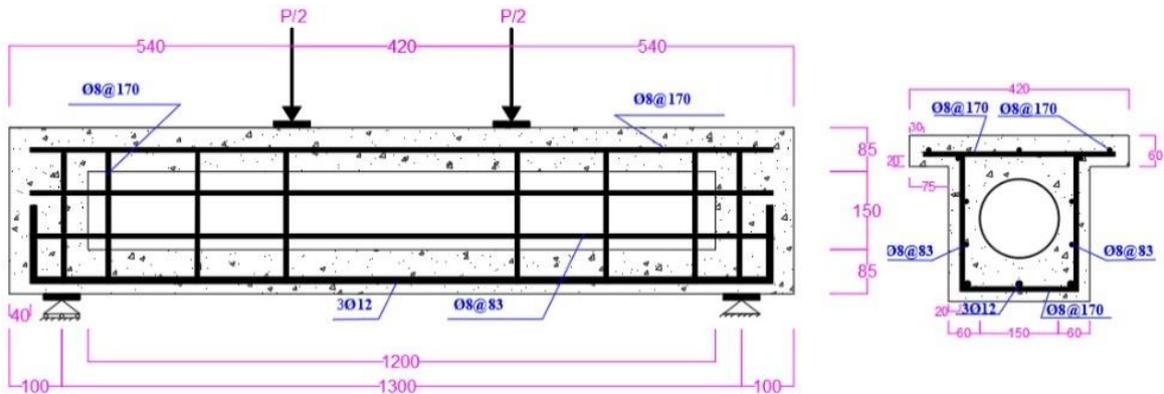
Dimensions and reinforcement details of (BCC) (all units are in mm)
